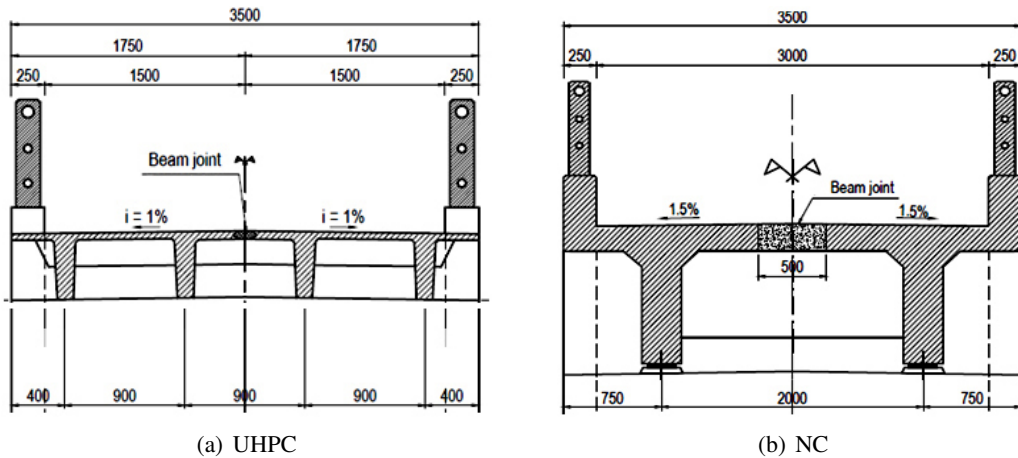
Cross-sections for the superstructure bridge using UHPC and NC
